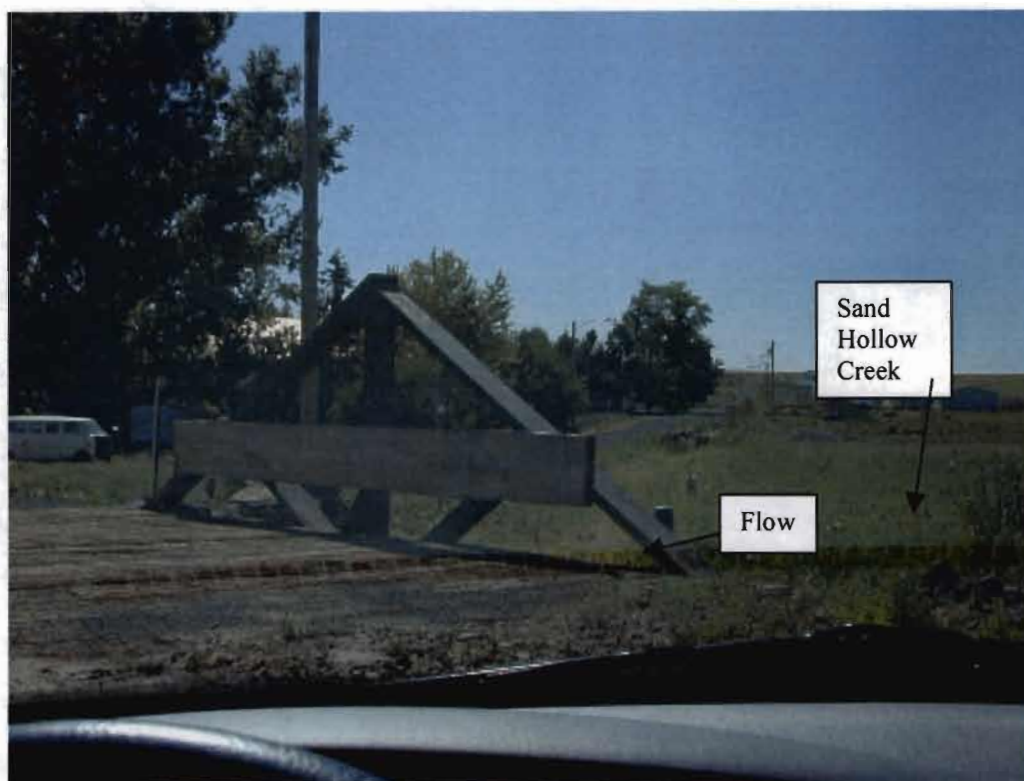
View looks southwest (upstream) at bridge on William St. over Sand Hollow Creek on north edge of town.
